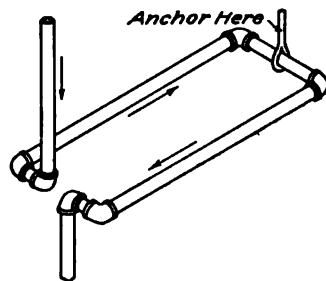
Expansion Joints. Offsets Nearly Horizontal.
